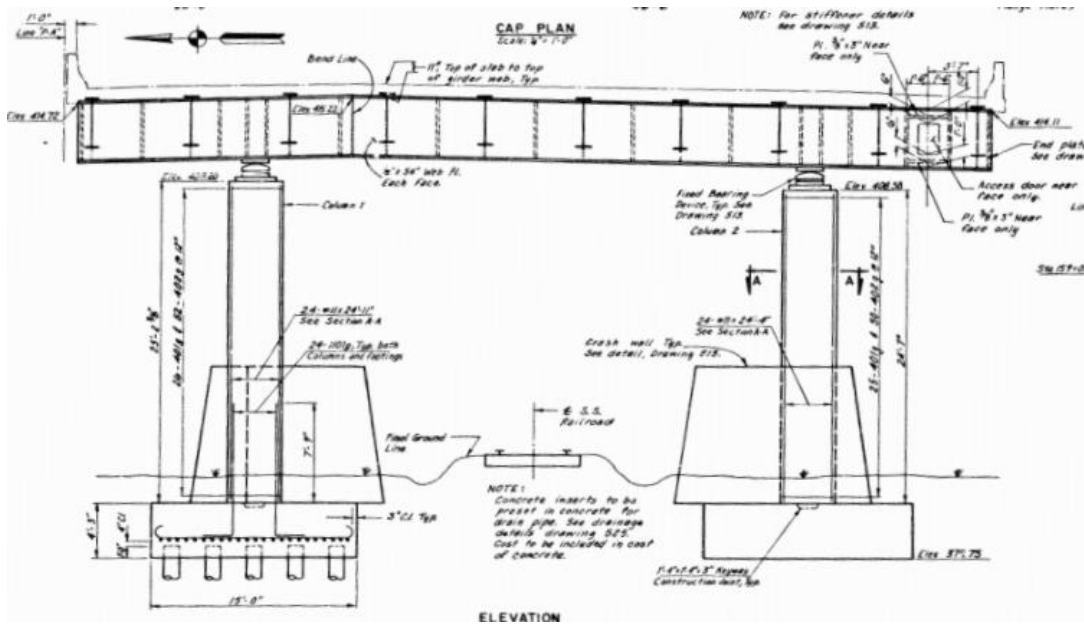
Transverse Elevation of Interior Pier (Pier 4) (NBI 21985) (1984)
